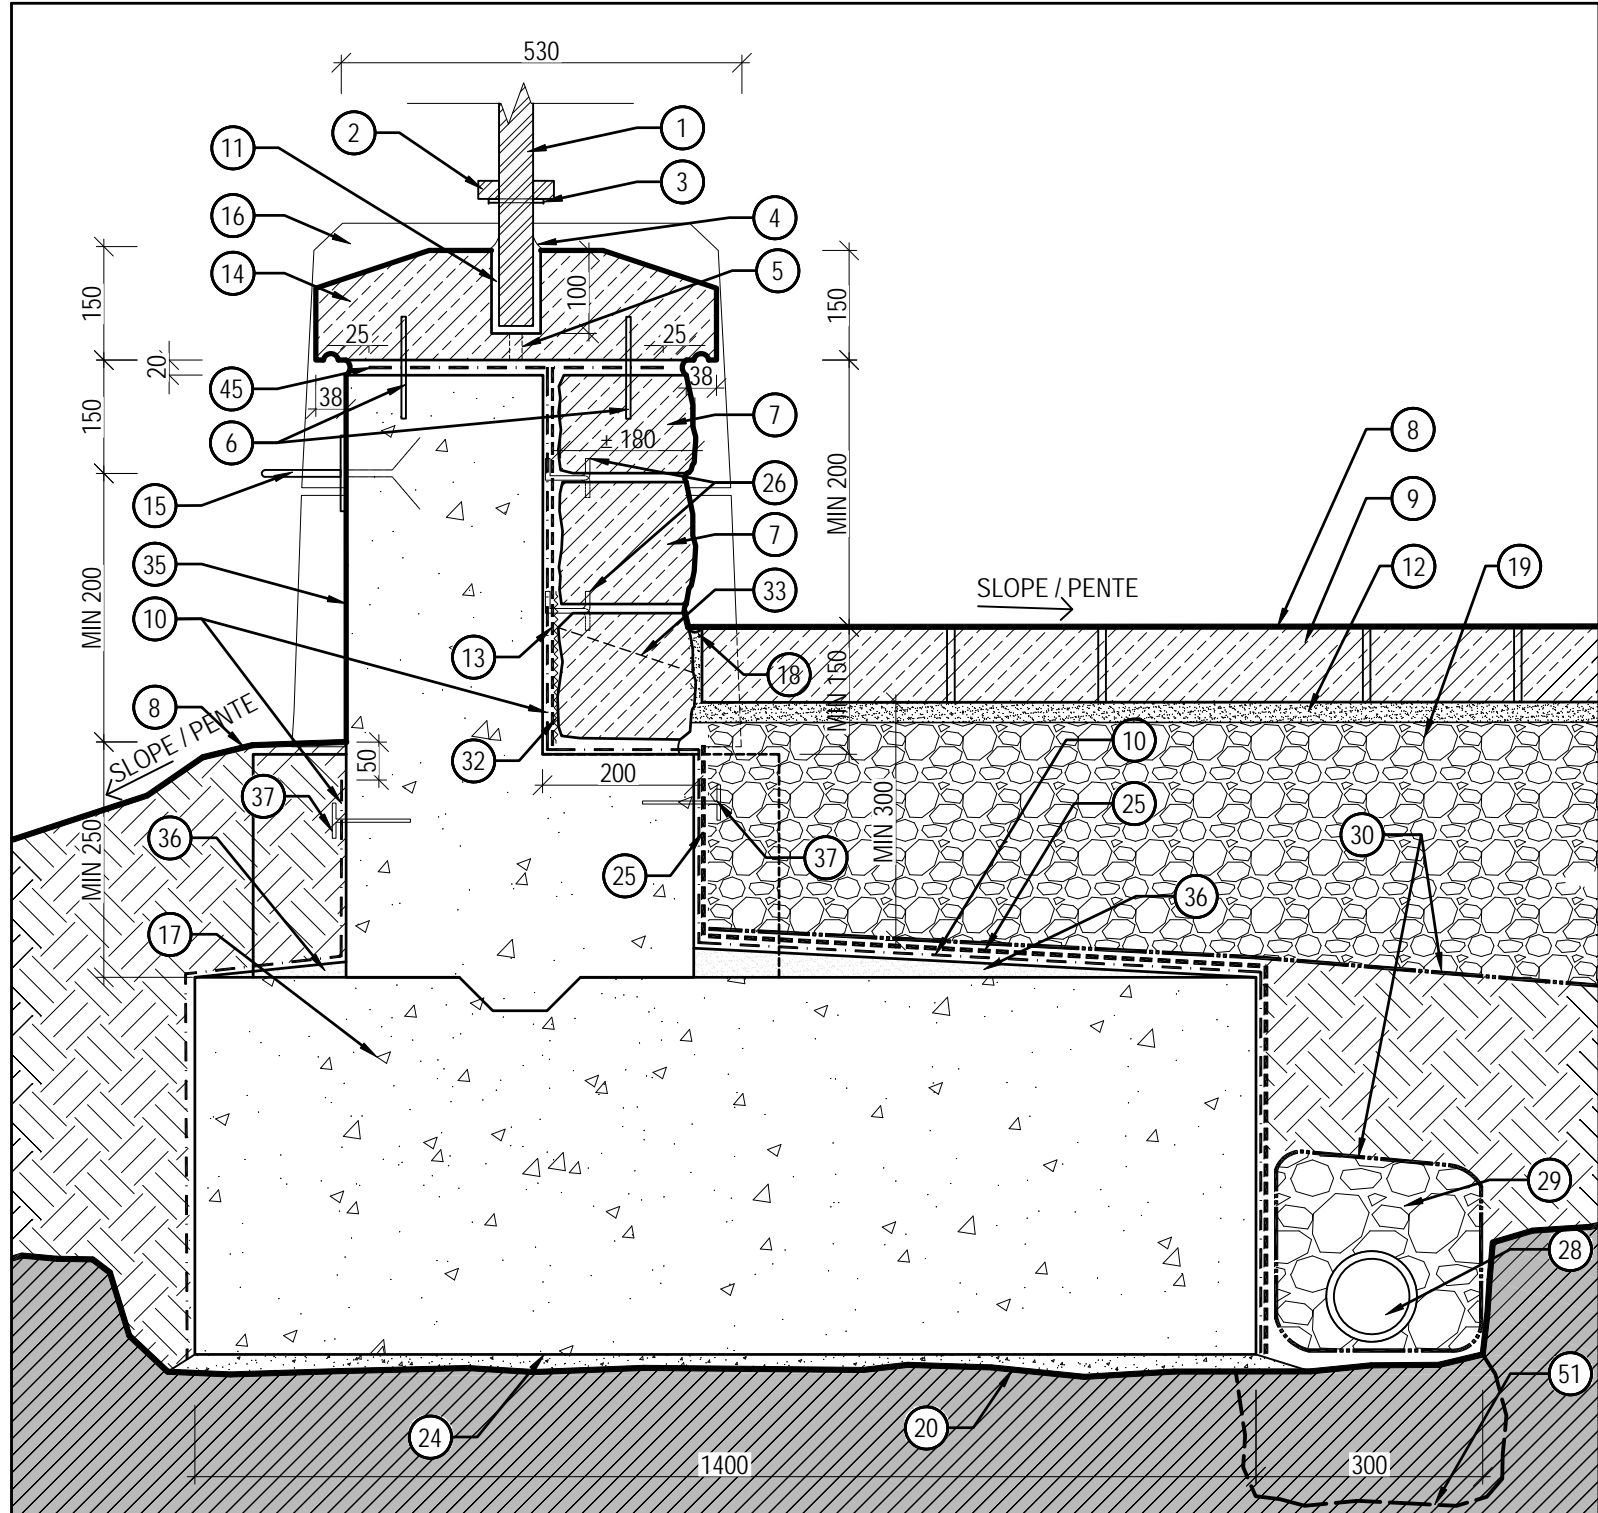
DETAIL - TYPICAL PIER SECTION ON BEDROCK
